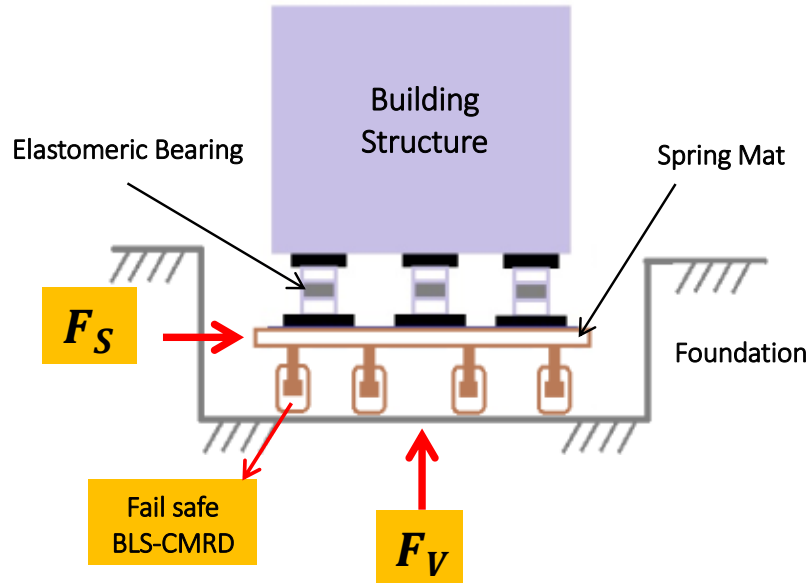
Schematic for the installation of the BLS-CMRD under a building structure.
